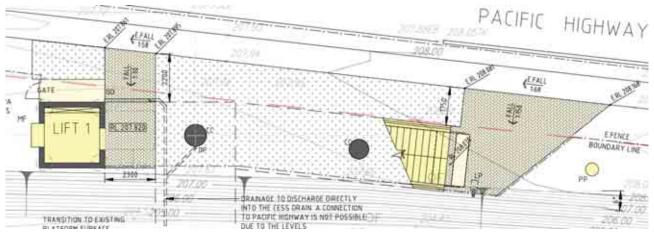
Proposed connection to the footpath on Pacific Highway
